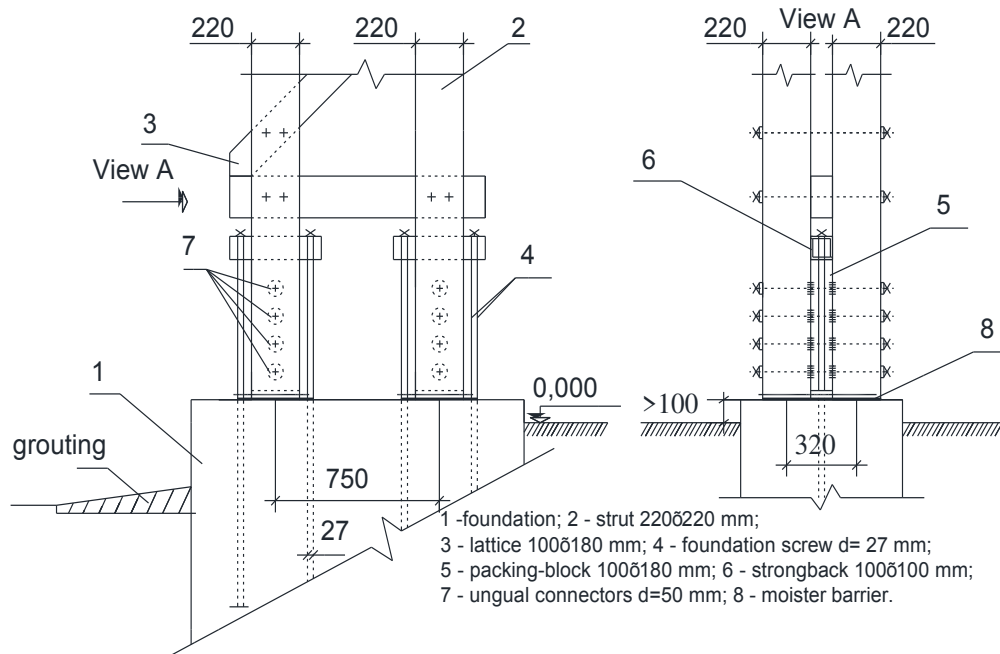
Variant of claw-type connectors in the design of built-in support in the foundation.
